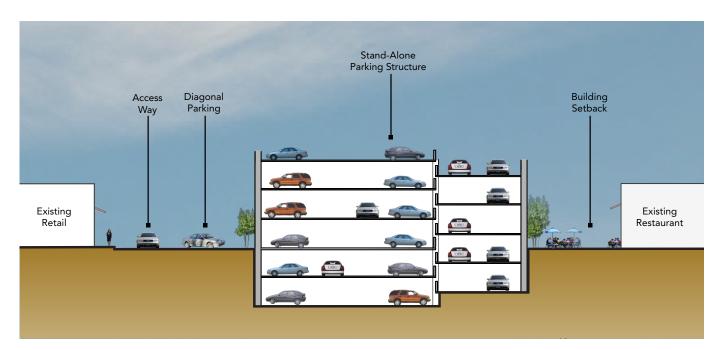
City-Funded Test Case 1—Cross Section of Stand-Alone Parking Structure, Plaza 3
